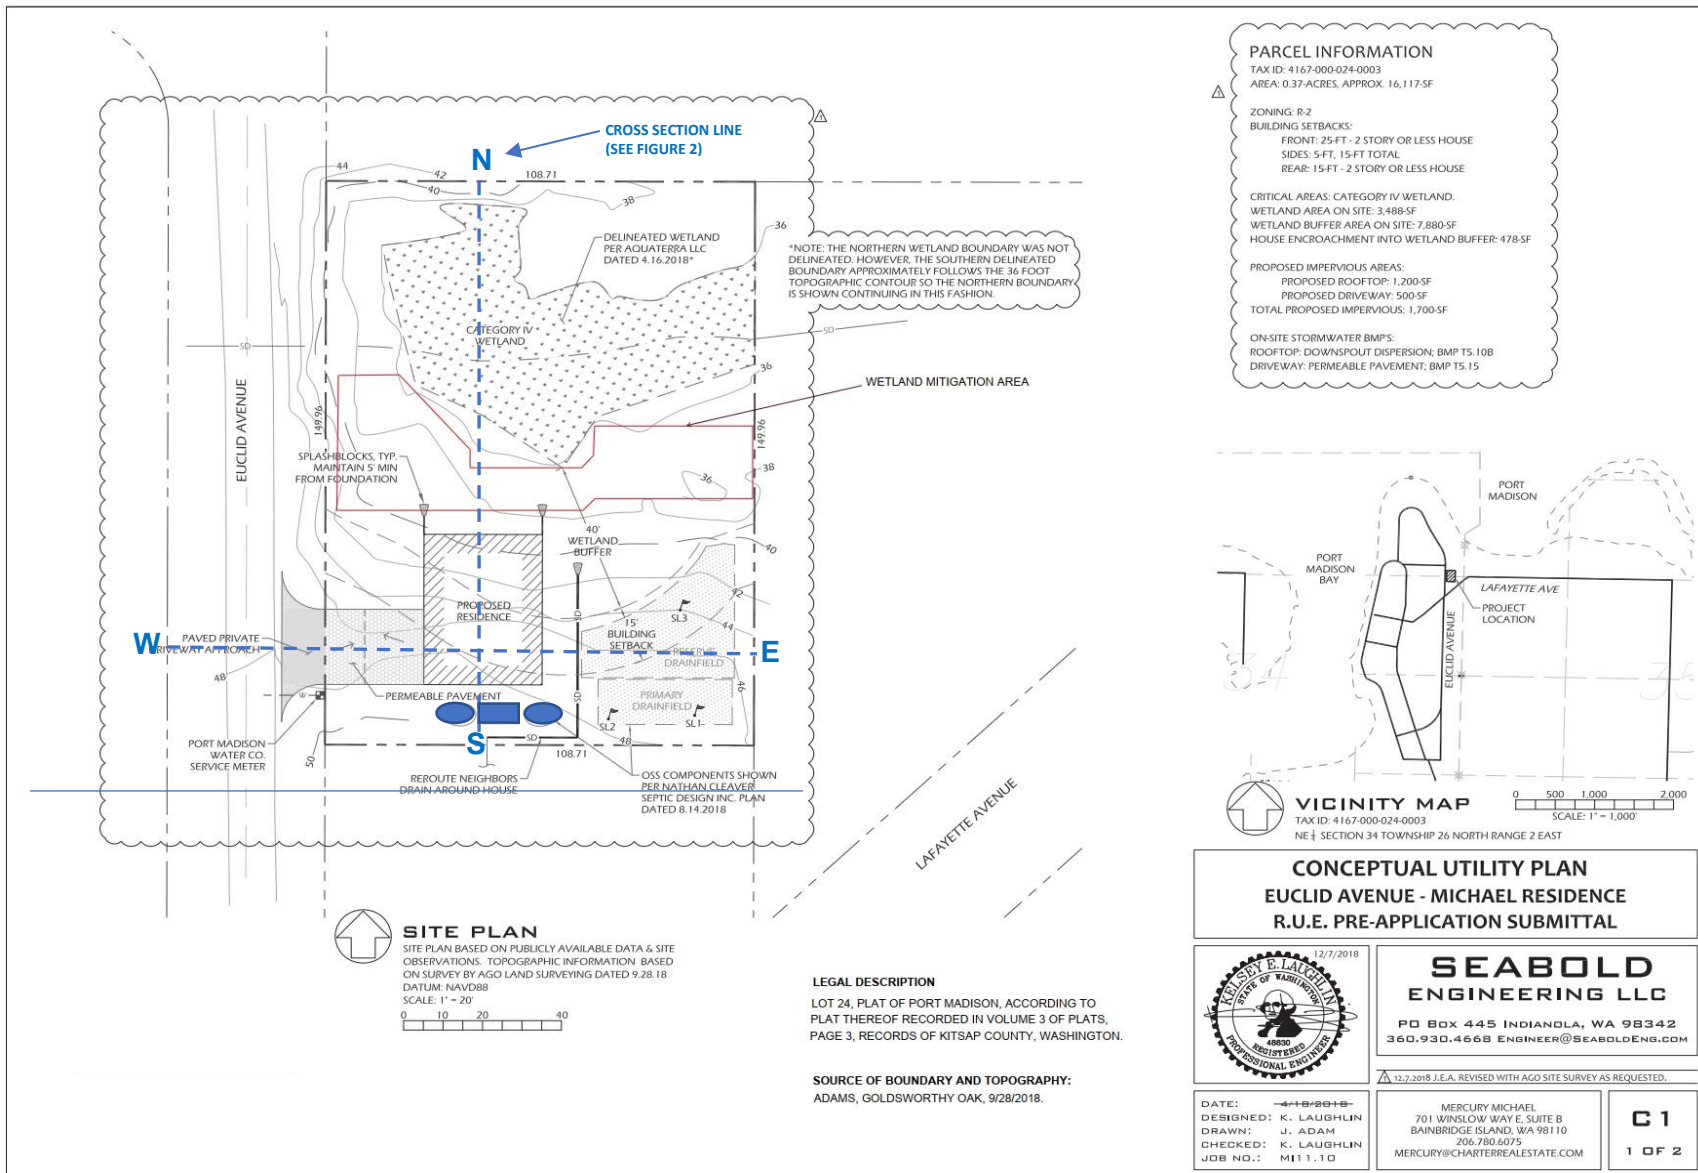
PROPOSED SITE DEVELOPMENT PLAN WITH CROSS SECTIONS
